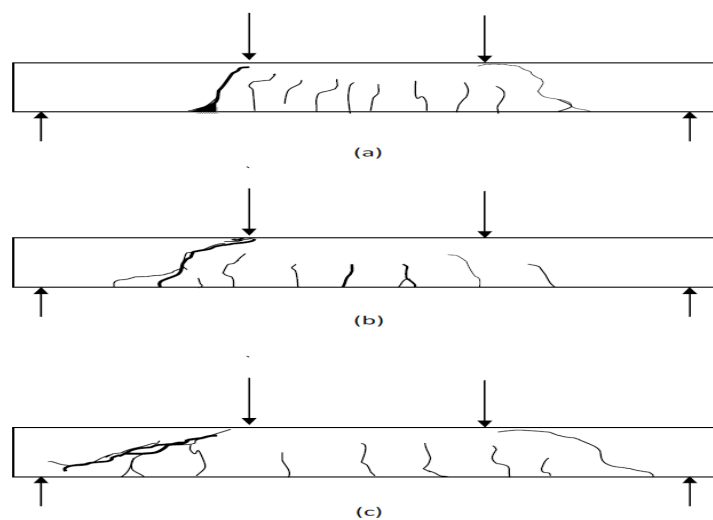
(a) Crack pattern of 0.73% reinforced beam, (b) Crack pattern of 1% reinforced beam, (c) Crack pattern of 2% reinforced beam
